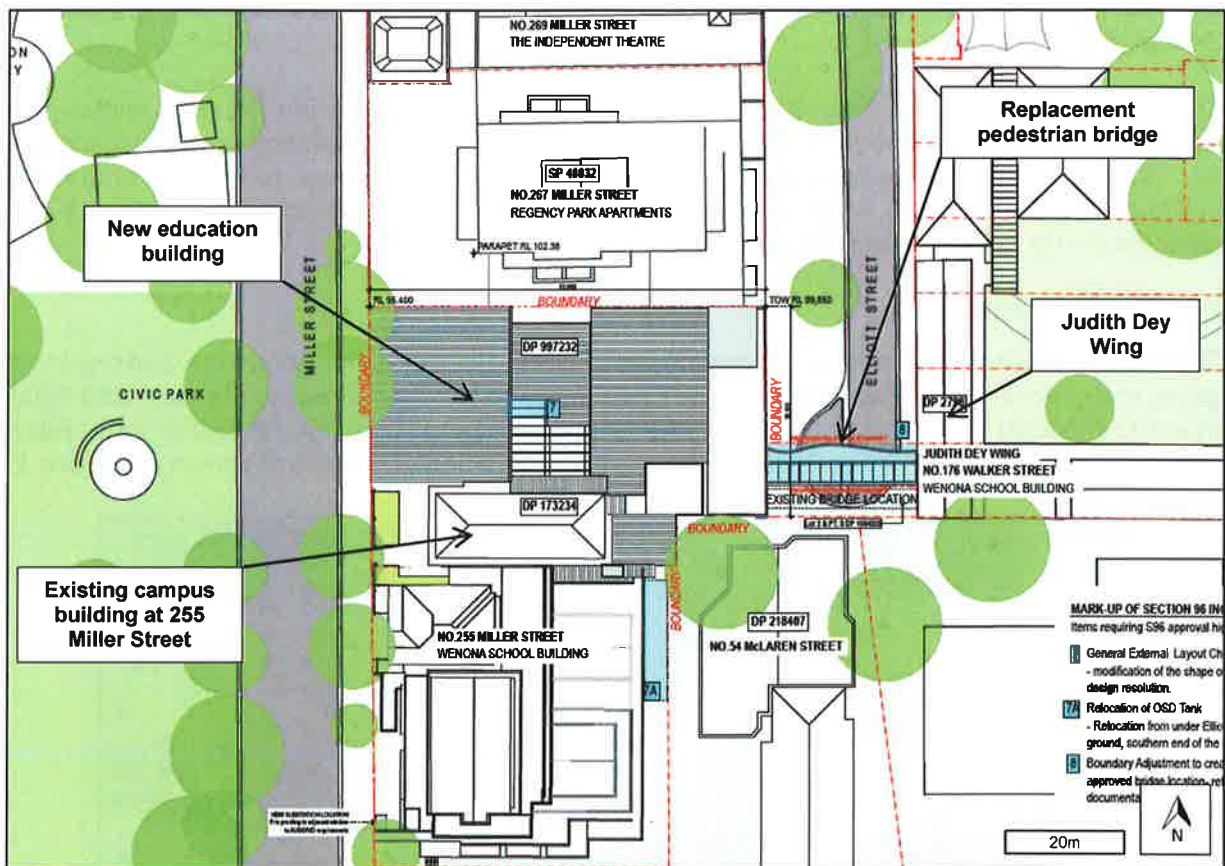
Extract from approved site plan (source: SSD 6952 MOD 1, 2017)
